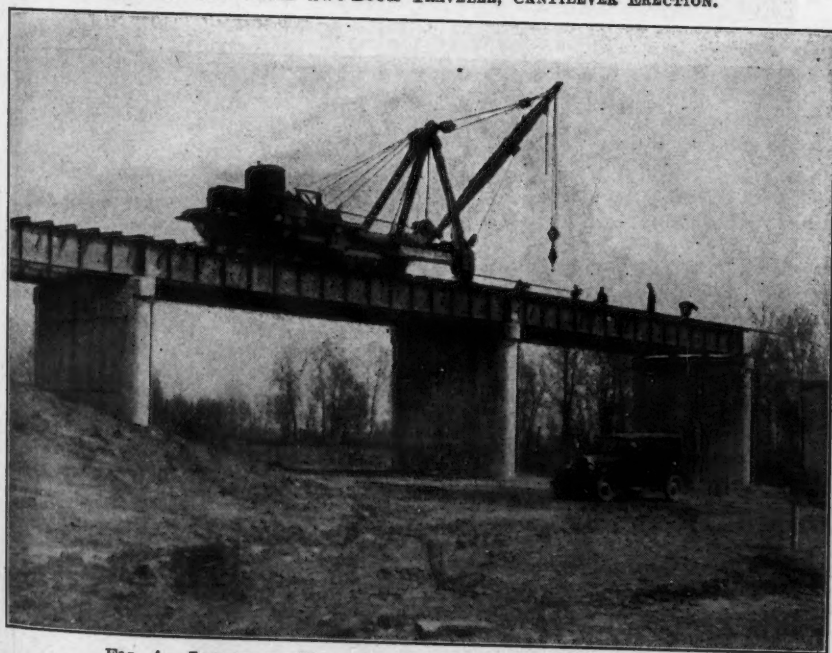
JINNIWINK TRAVELER ERECTING GIRDER SPANS ON PIERS.
